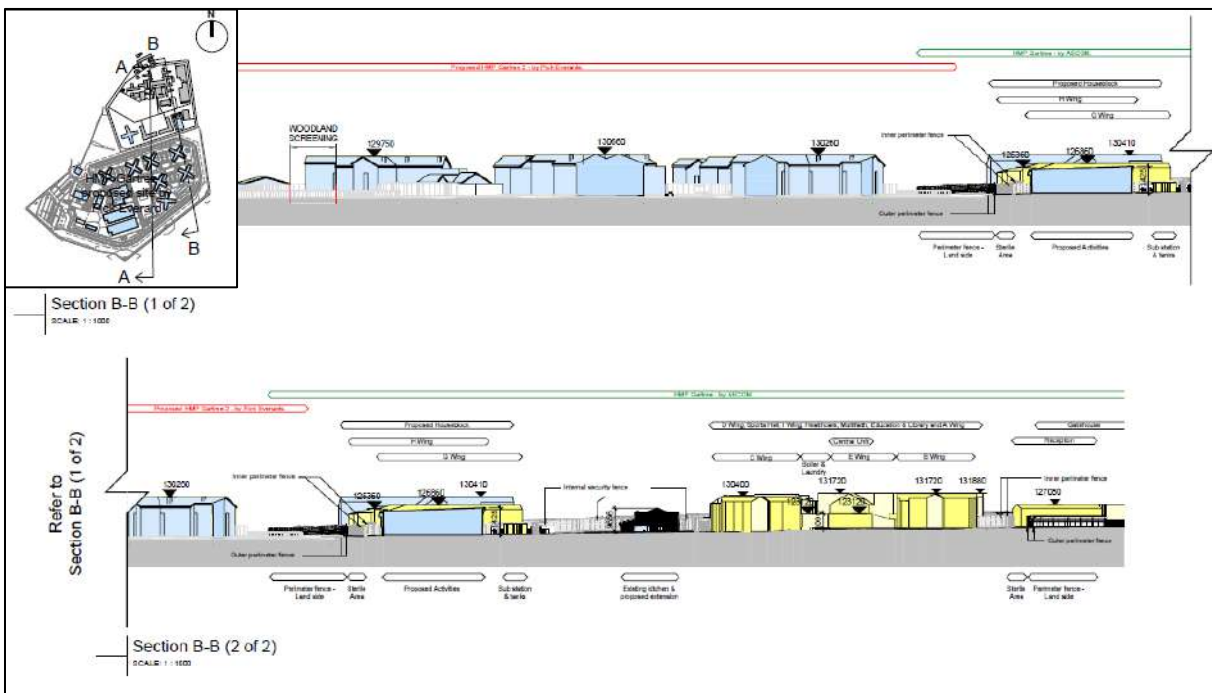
Cross Section BB through the proposed site and the existing HMP Gartree
